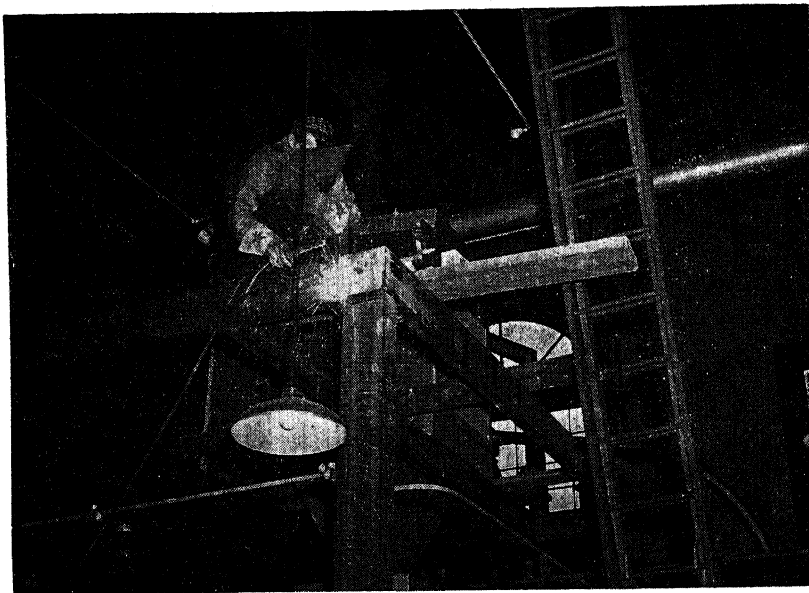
Erecting a structure for support of new grain mill in a brewery. Completely fabricated and erected by the welding department.
